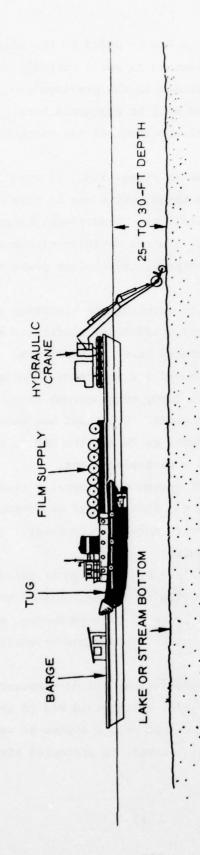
OVERALL FILM OVERLAY EQUIPMENT ARRANGEMENT.
